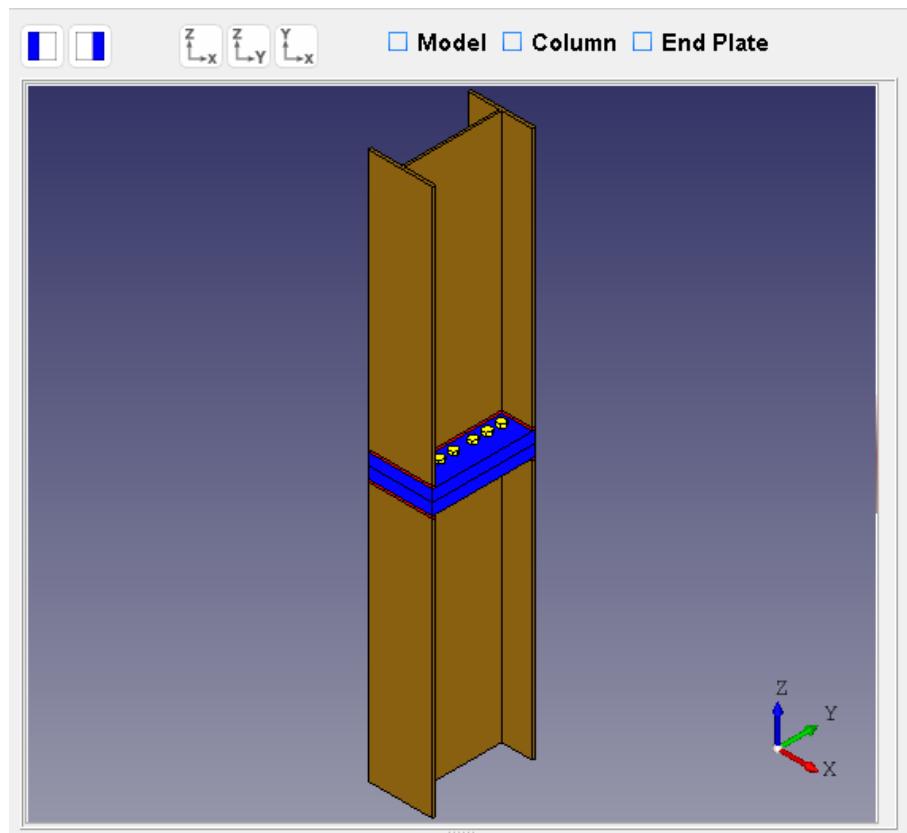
3D drawing output of typical Column to Column End plate connection
